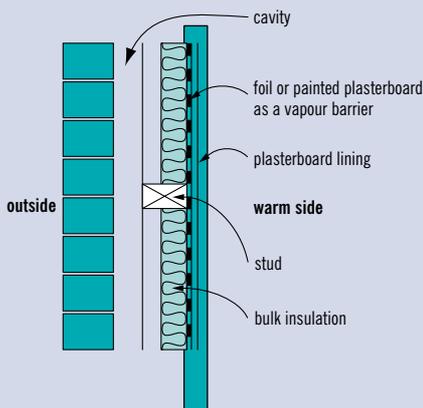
Place vapour barrier on the warm side of insulation (brick veneer wall)
